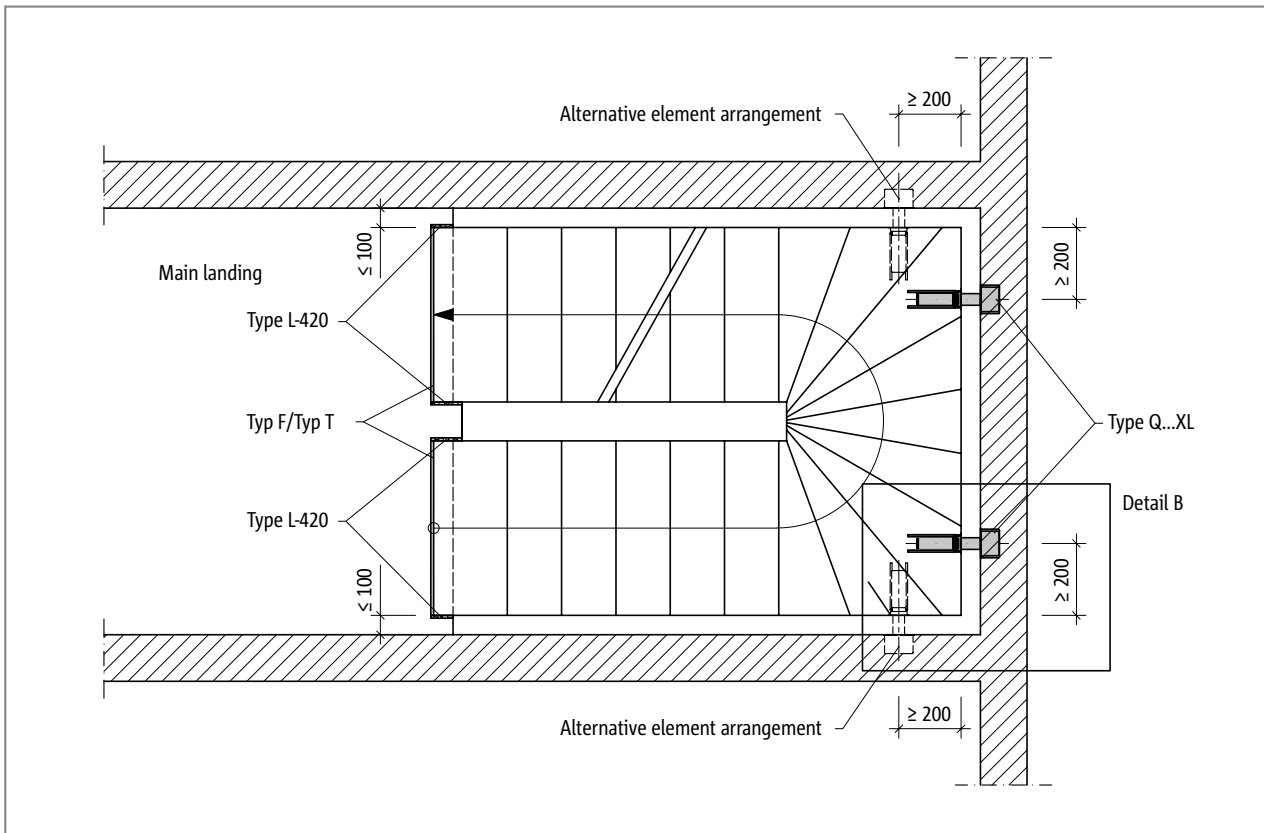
Schöck Tronsole® type Q...-XL: Component arrangement in the layout with a joint width of maximum 100 mm
